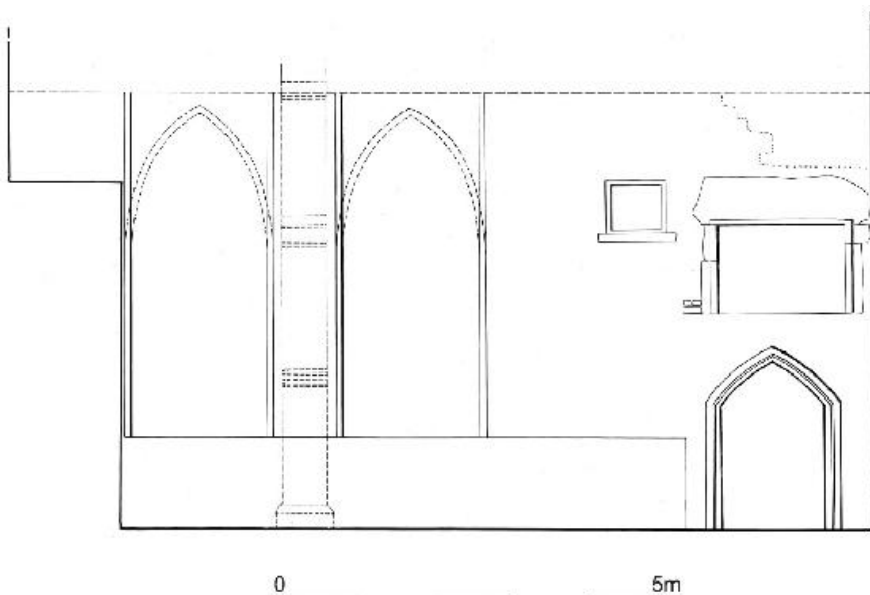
Outline reconstruction of the east elevation of the hall of 29 Castle Street, superimposed on existing features, including the now-isolated 17th-century fireplace belonging to the first floor of a building, since demolished, abutting the entrance to the screens passage, right, that was added against the hall
